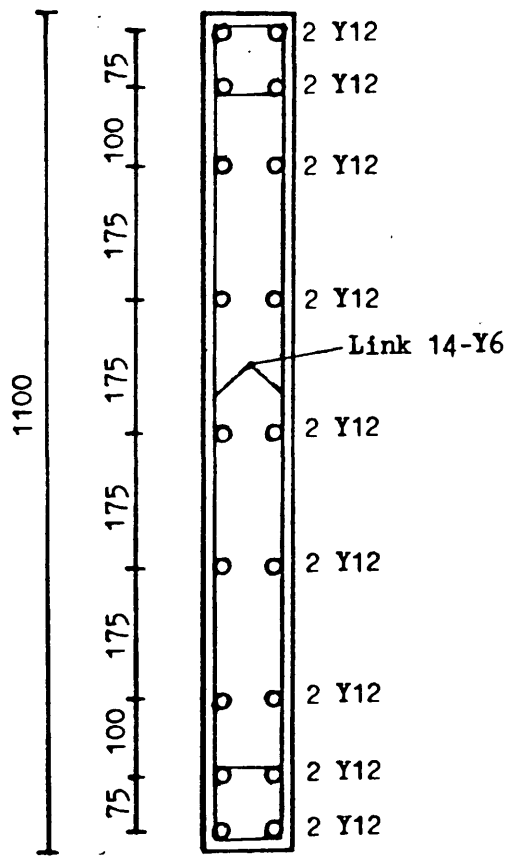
A horizontal section in the wall of model MRS15 showing the reinforcing details
